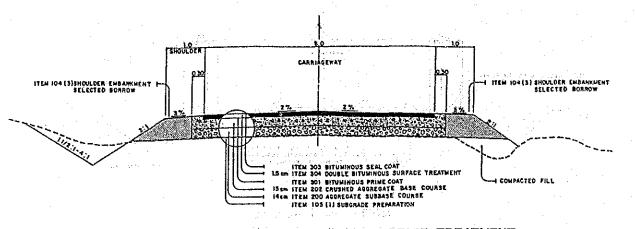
(2) TYPICAL ROADWAY SECTION CONSTRUCTION SECTION NO. 1
